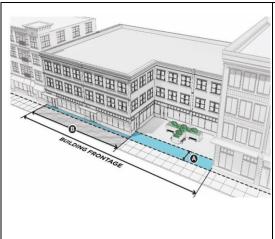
BUILDING PLACEMENT WITH PLAZAS AND COURTYARDS
